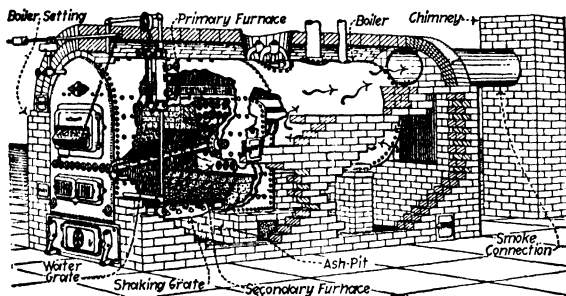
Horizontal smoke connection on Kewanee boiler.
